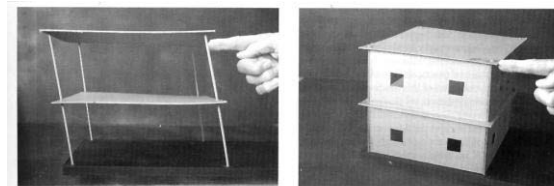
(a, b) Structural frame stabilized by adding shear panels.
